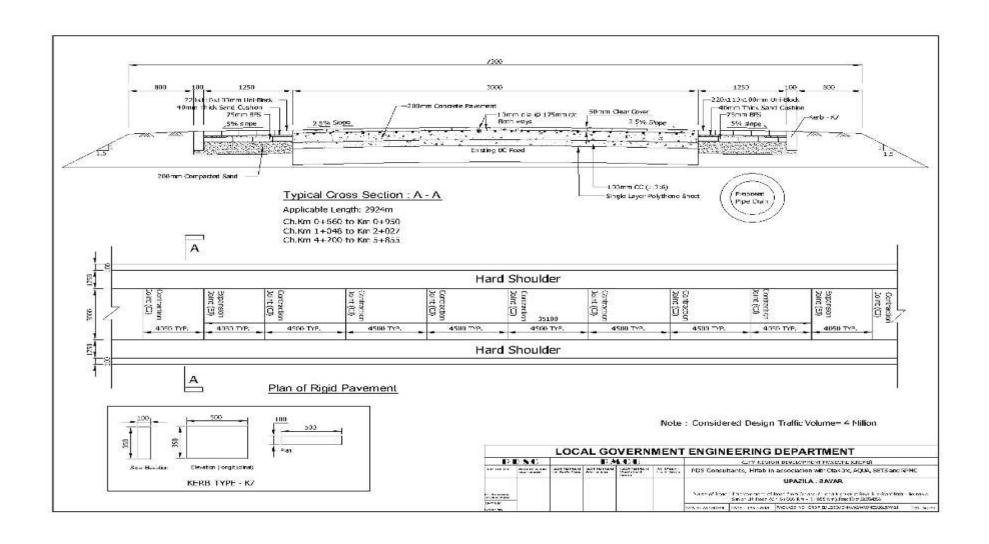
Typical cross section (Ch. 0+600 to 0+950, 1+048 to 2+027 & 4+200 to 5+855 km) and Plan of Rigid Pavement & Hard Shoulder)
